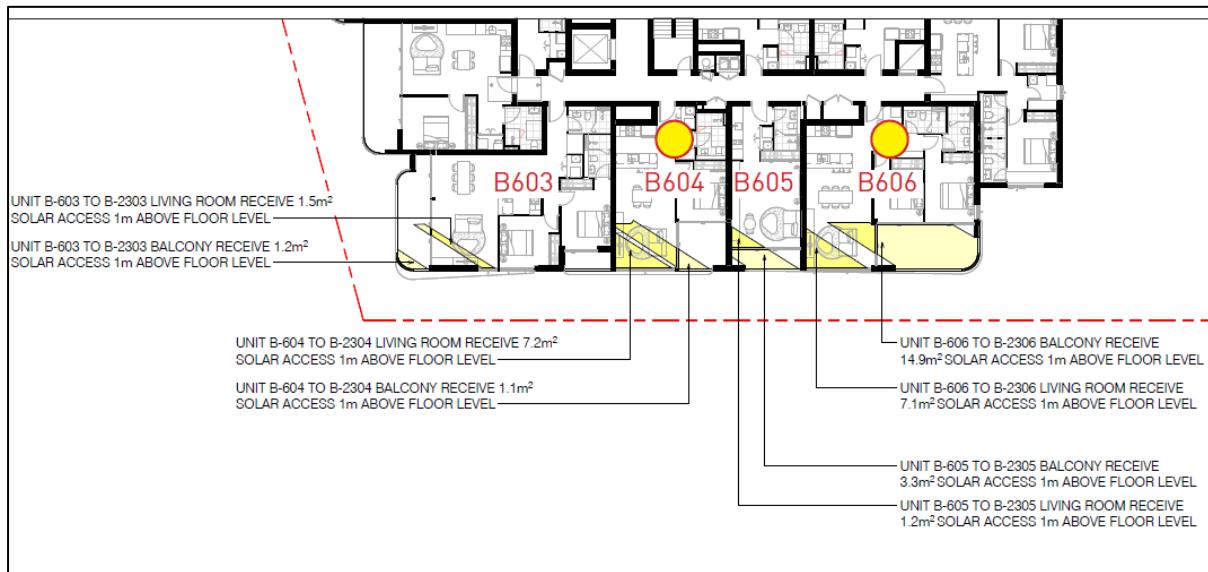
Solar penetration diagram; Building B at 9am 21st June (Source: PTW Architects)
